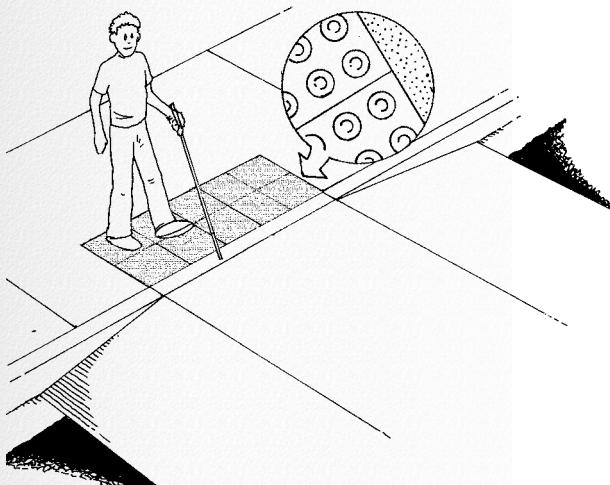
A 610 mm (24 in) strip of detectable warnings should be installed at the edge of a raised crosswalk to identify the transition between the sidewalk and street.
